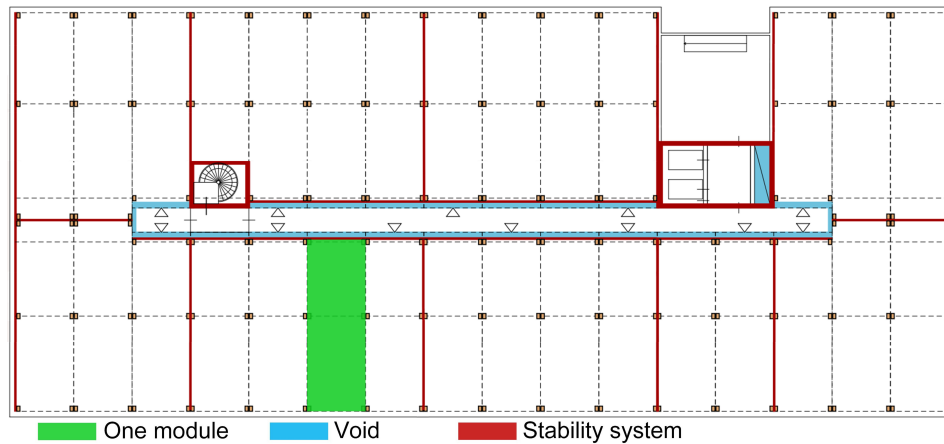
Floor plan of the reference building from Pieters Bouwtechniek
